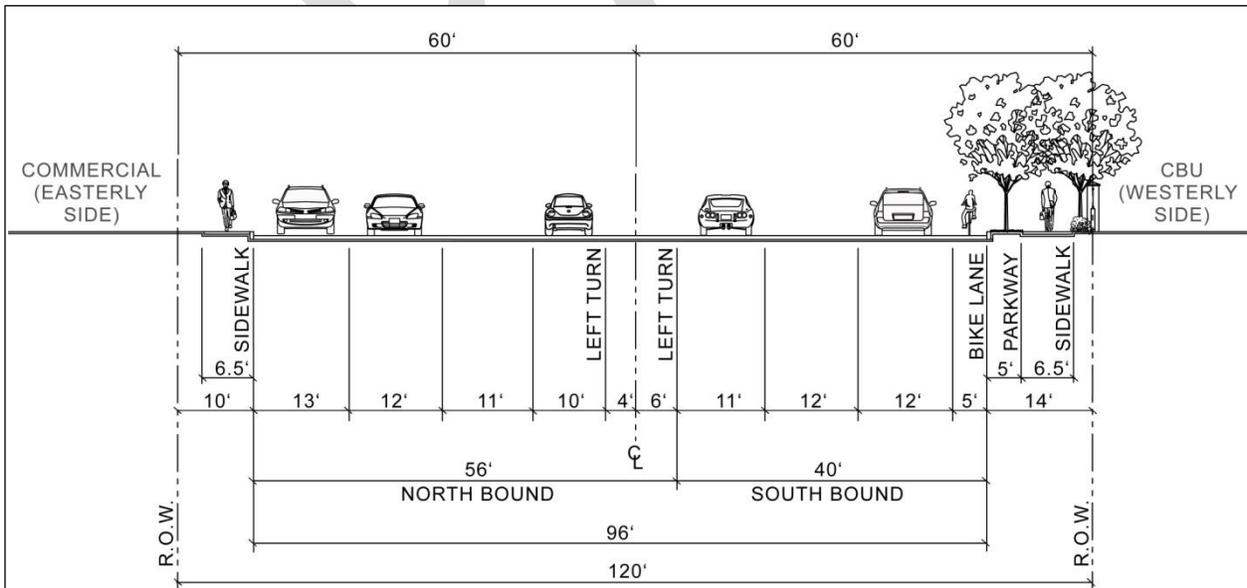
ADAMS STREET MODIFIED 120-FOOT ARTERIAL (MAGNOLIA AVENUE)
